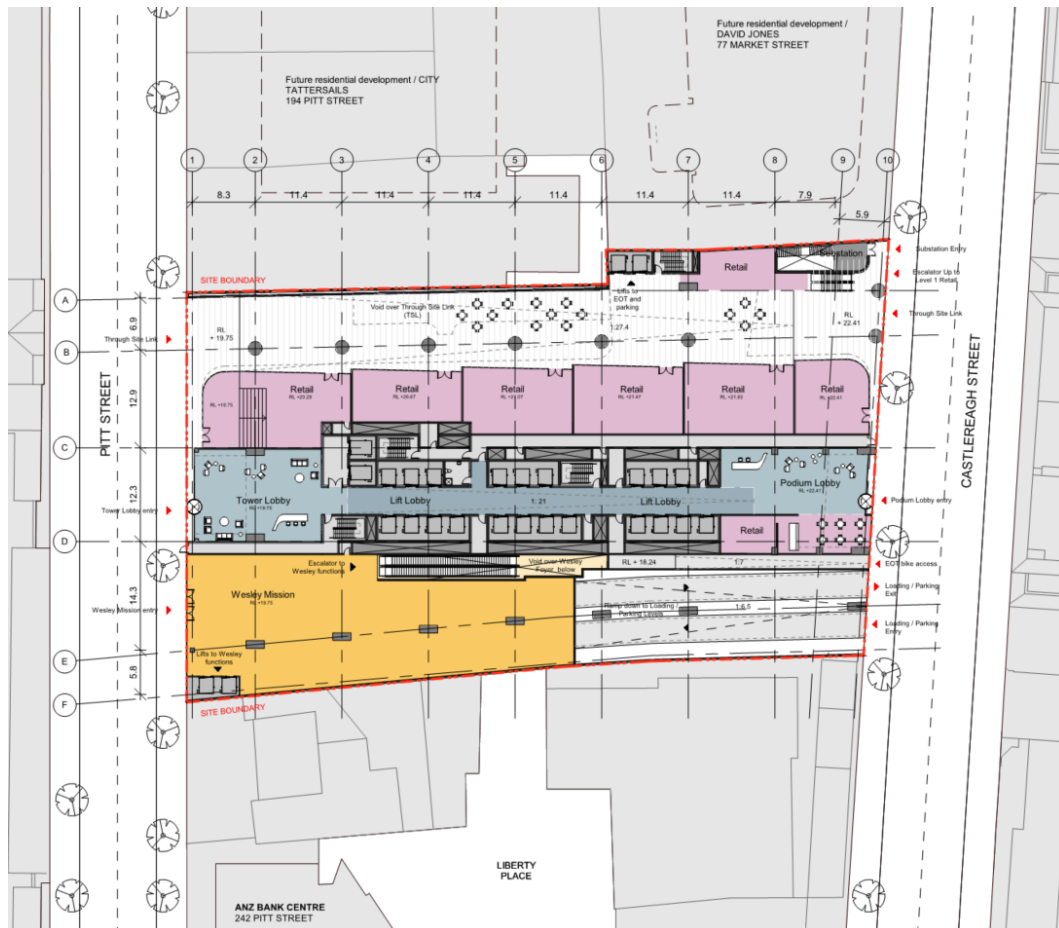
Stockland Piccadilly Complex – Concept Reference Design - Ground plan (3XN, 55001\_200805)
